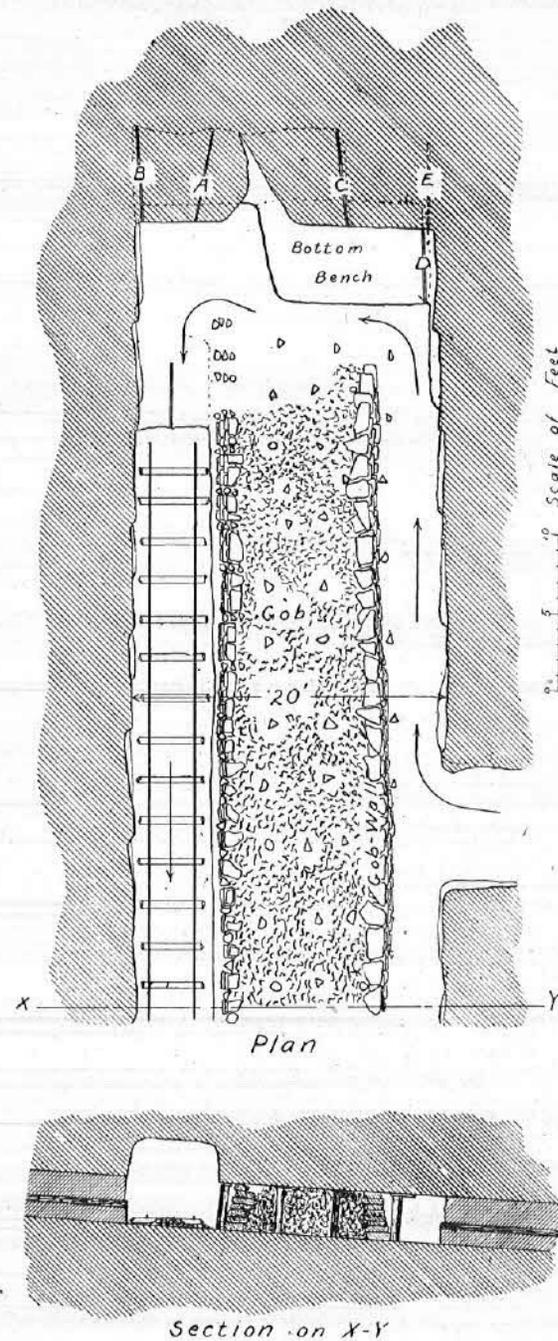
Plan and section of a brushed entry with gob walls, at Spadra.
